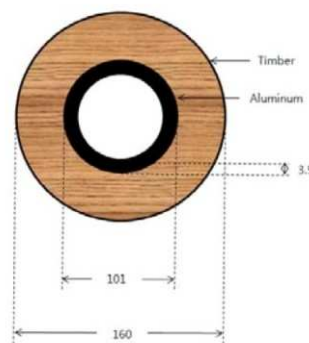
Hybrid beam consisting of hollow timber section and inner aluminium or steel pipe (139)
